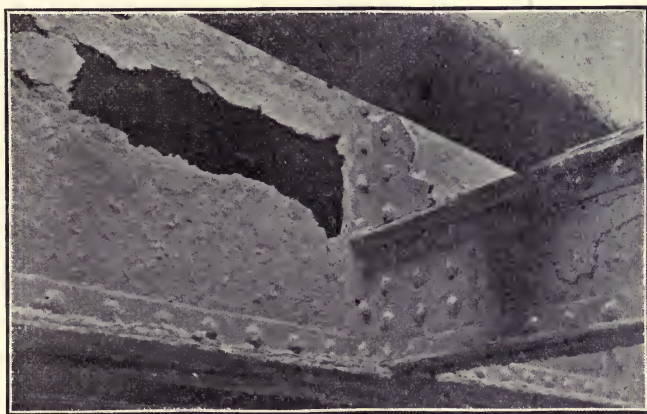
Corrosion of steel girder, Washington Street railway bridge, Boston, Mass.
